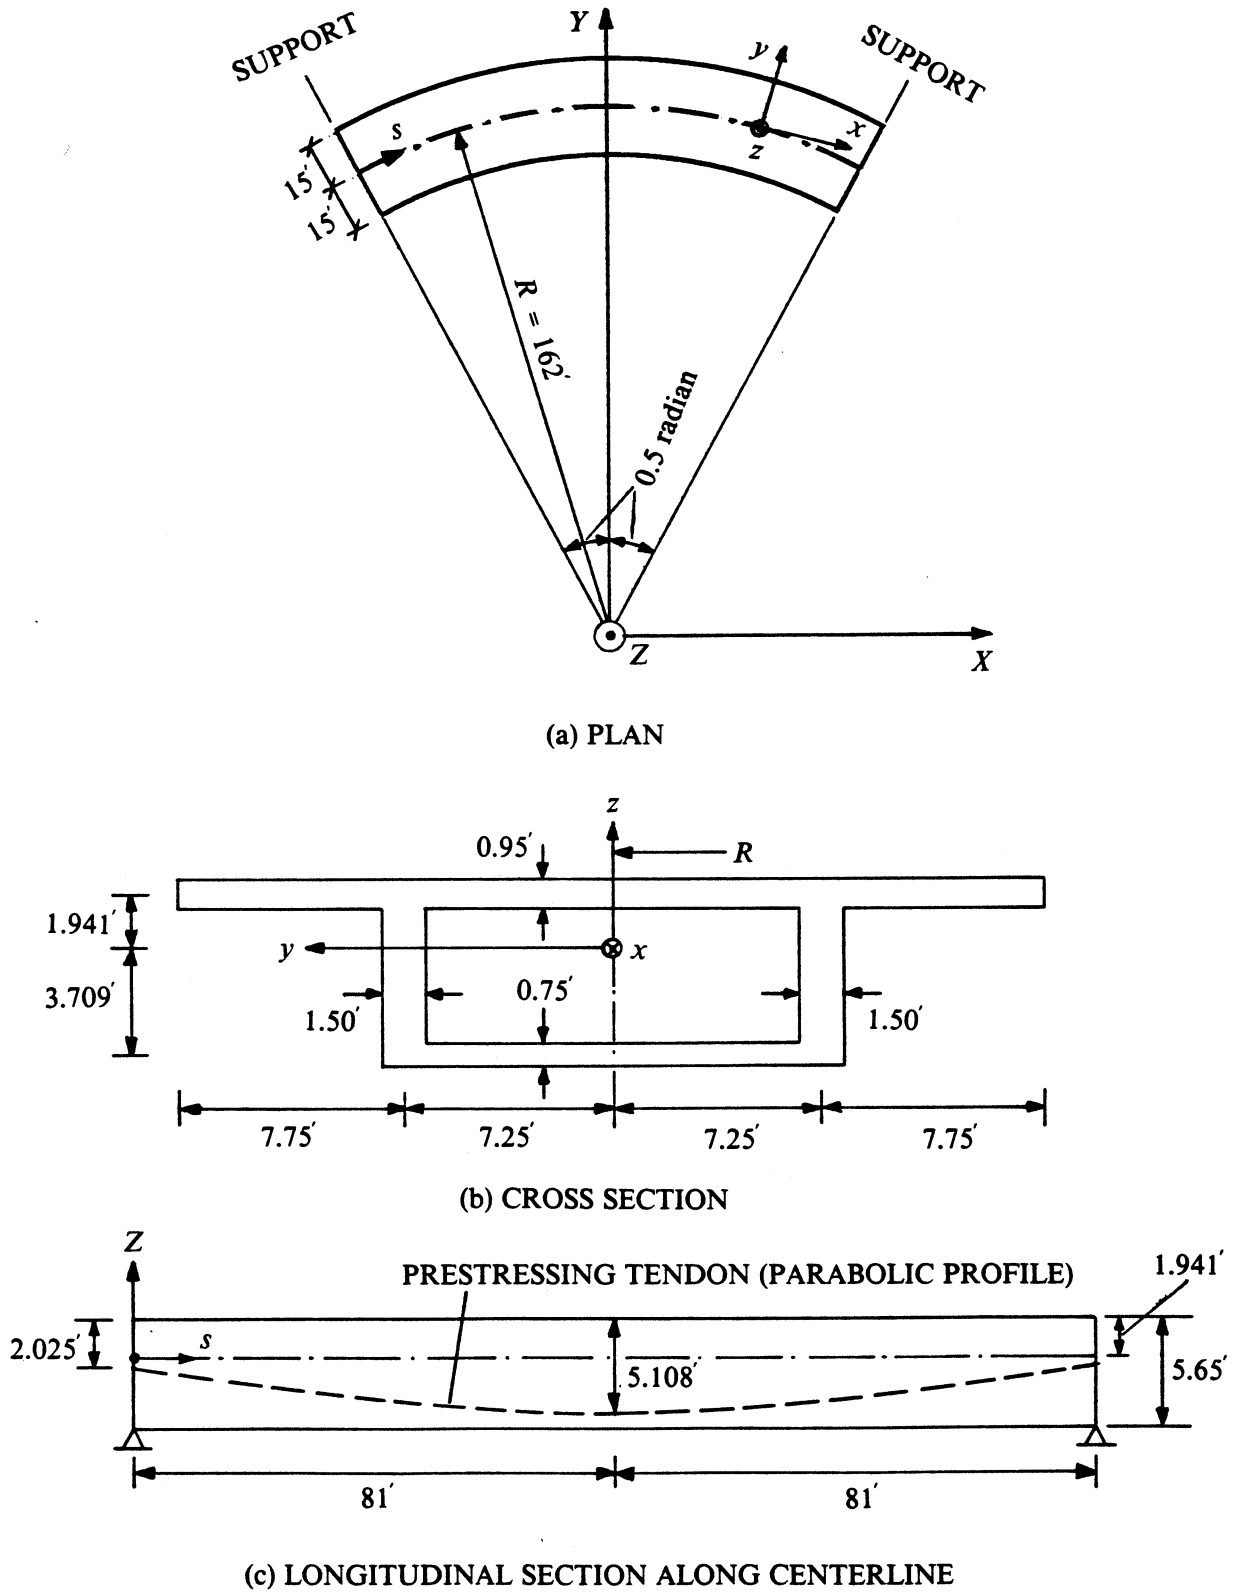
EXAMPLE 4.4 - CURVED SIMPLY SUPPORTED PRESTRESSED CONCRETE BRIDGE
